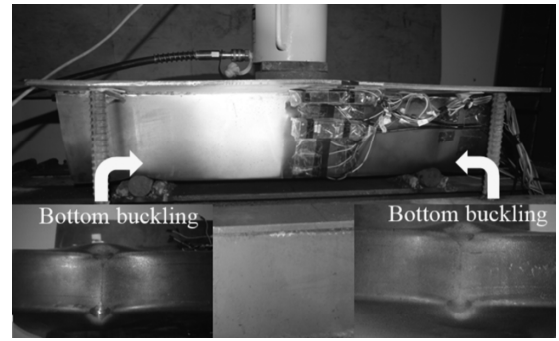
Static load failure diagram of the steel box girder test piece.
